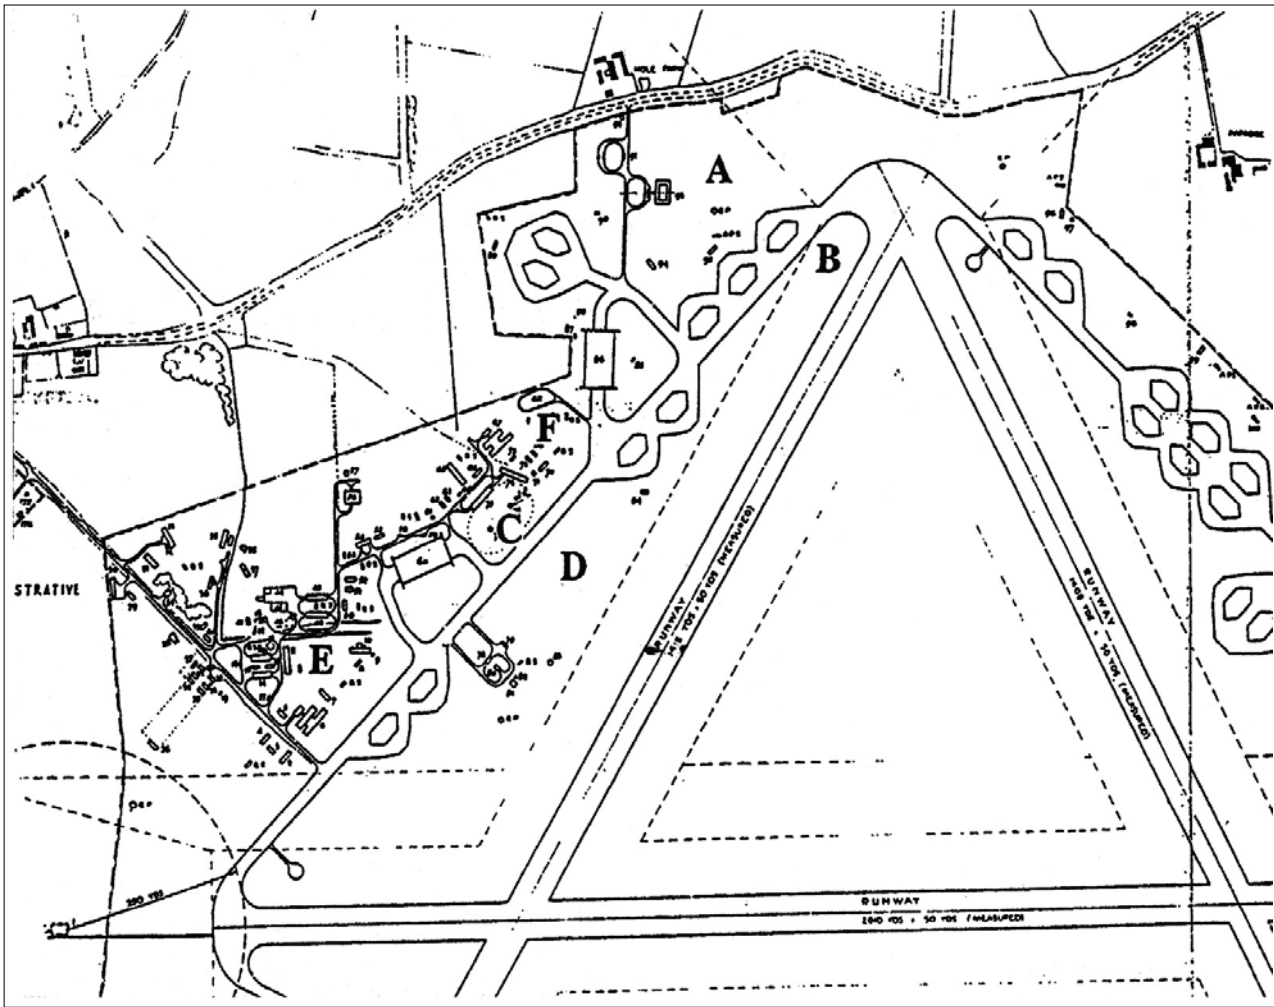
Plan of Witchford airfield, 1944 (Cambs Coll. C.45.7)
